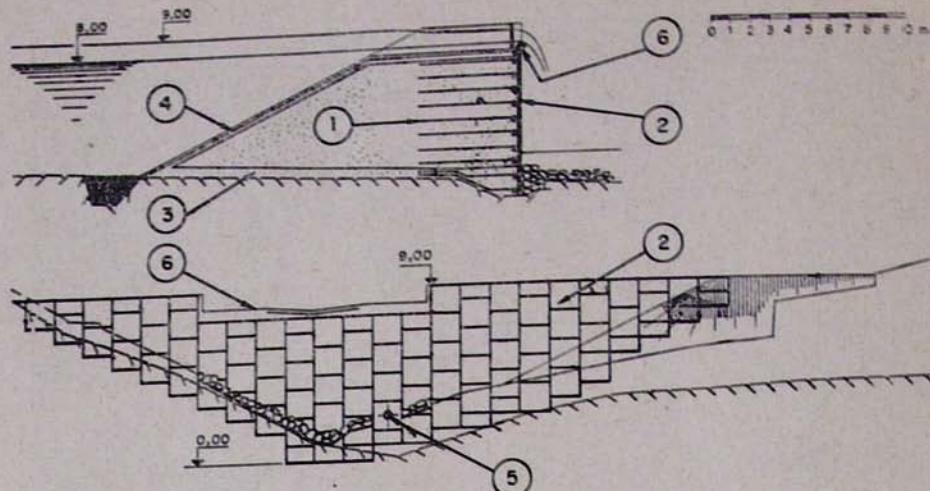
Typical section and downstream elevation of Vallon des Bimes dam; 1—Reinforcing strips; 2—Concrete scales; 3—Drainage blanket; 4—Watertight facing and lean concrete protection; 5—Bottom outlet; 6—Overflow weir.
